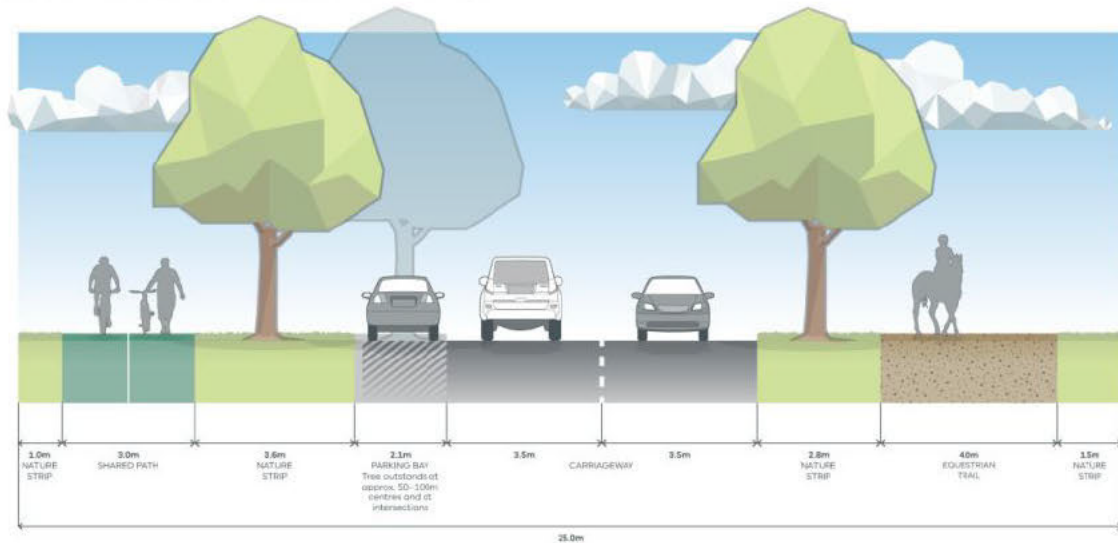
Cross Section 13 (Source: CCSPSP March 2026)
